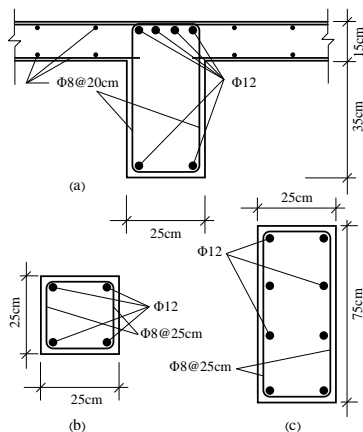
3D building element sections a) typical T-shaped beam; b) Cs and c) Cr
